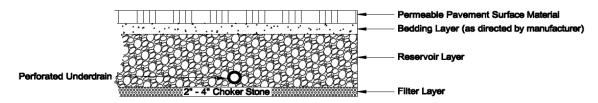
Cross Section of a Standard Permeable Pavement Design.
